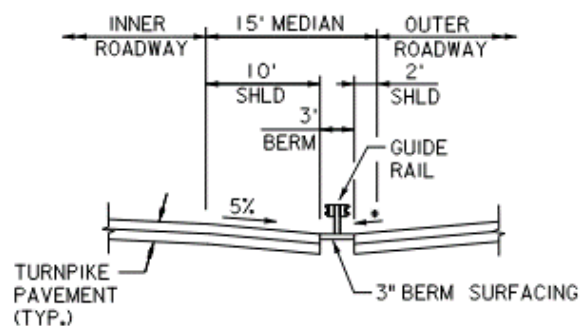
Inner-Outer Typical Sections (14 Lanes)
